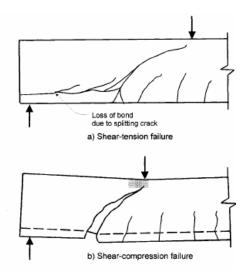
Modes of shear failures in short Beams (ASCE-ACI 426, 1973)
